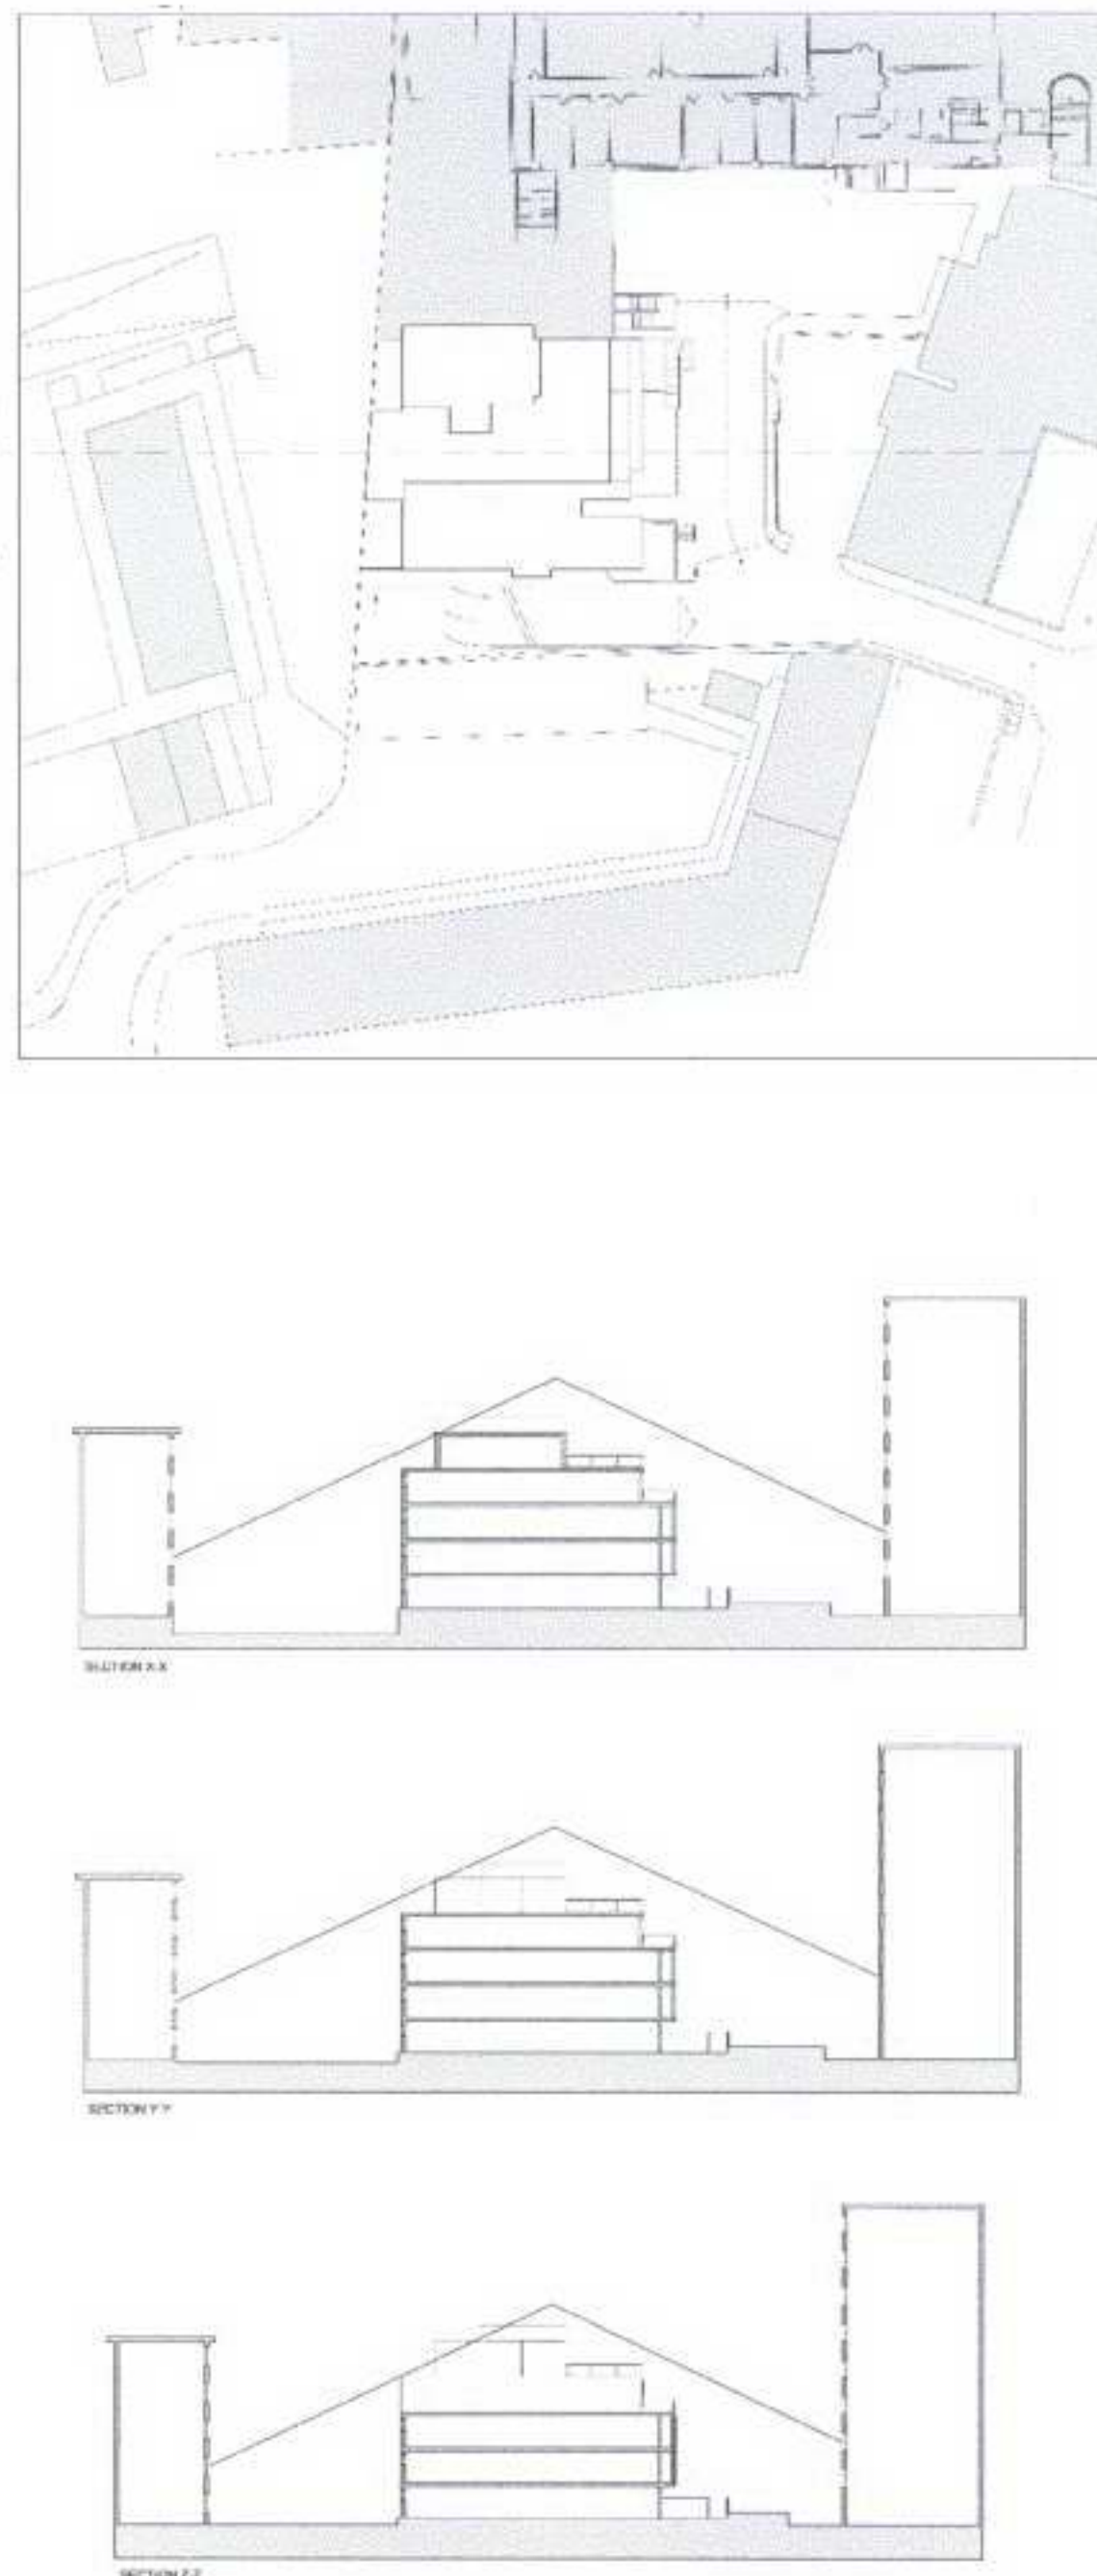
Sections of Campden House, Swiss Terrace and Station House (First Floor Windows)
